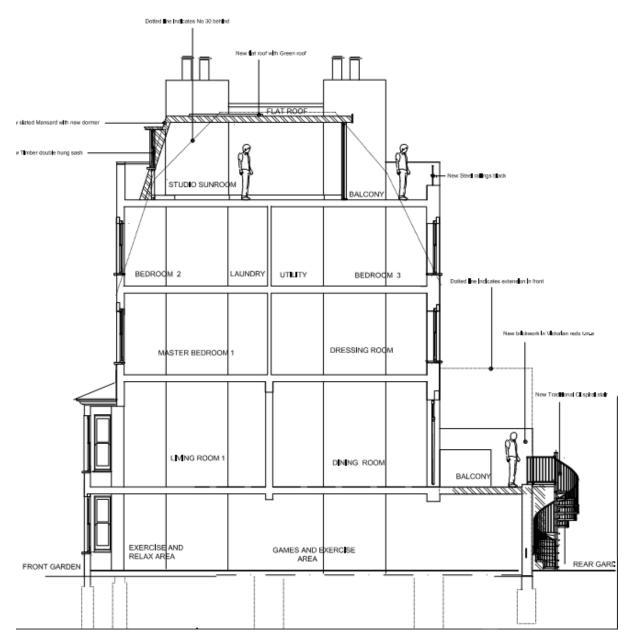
(above): Proposed section showing mansard extension and rear extension (source: Application proposed drawings)
